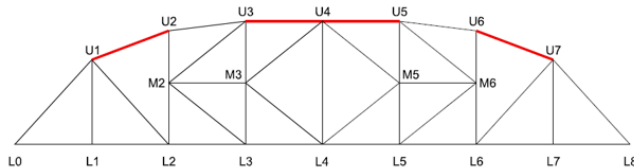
Overstressed Truss Members (Span 4) – Rehabilitation with Widening
